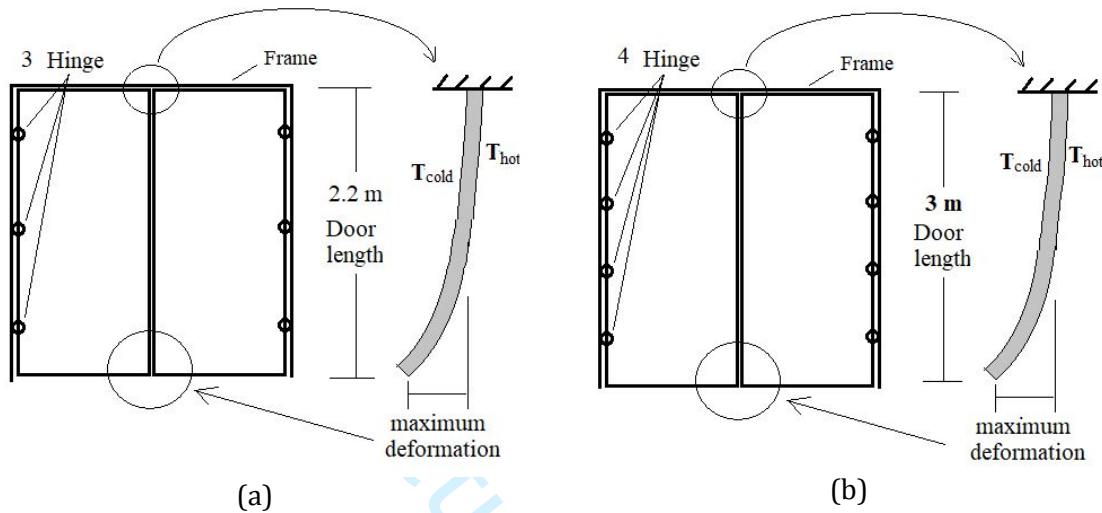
schematic drawing fire door deflection (a) 2.2 m three hinges door length (b) 3 m four hinges door length
